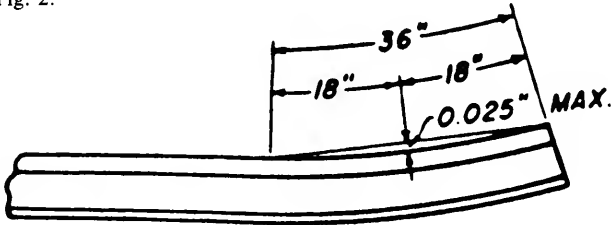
Side Elevation of Rail Uniform Upsweep Tolerance at Rail Ends per Section 14.3
